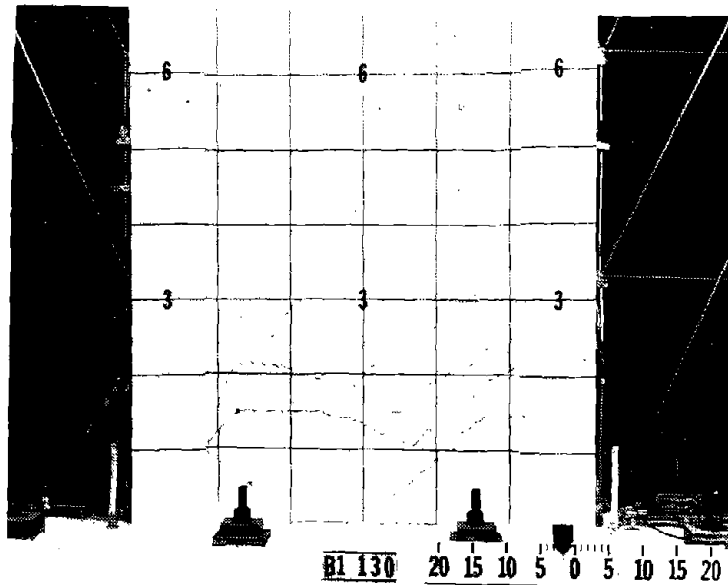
Cracking Pattern at -3 in. Deflection for Specimen B1
